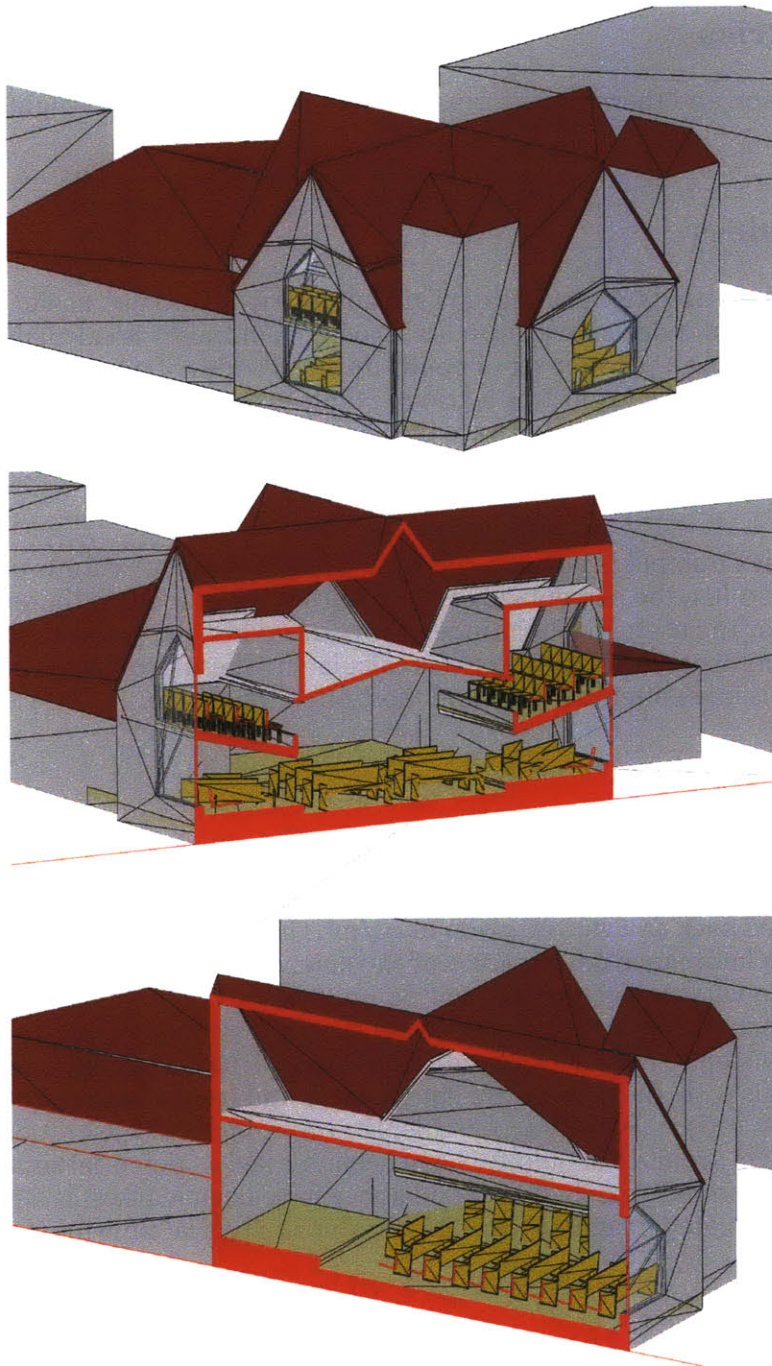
Screenshot of the Ecotect model of the Logan Christian Church after renovations; east-west section looking north; north-south section looking east.
